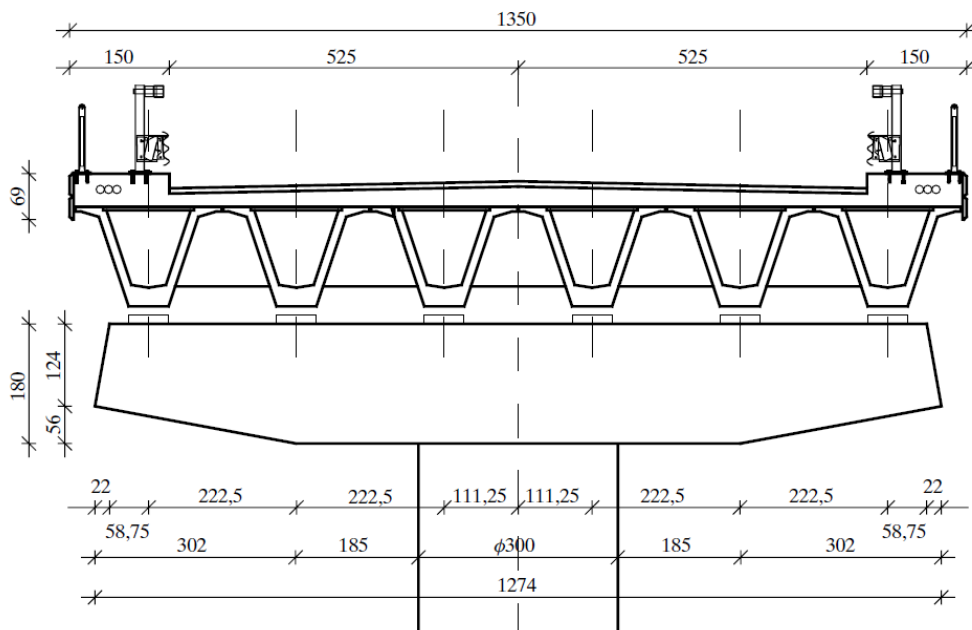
Typical cross section of Isola della Scala Bridge (unit: 10^{-2} m).
